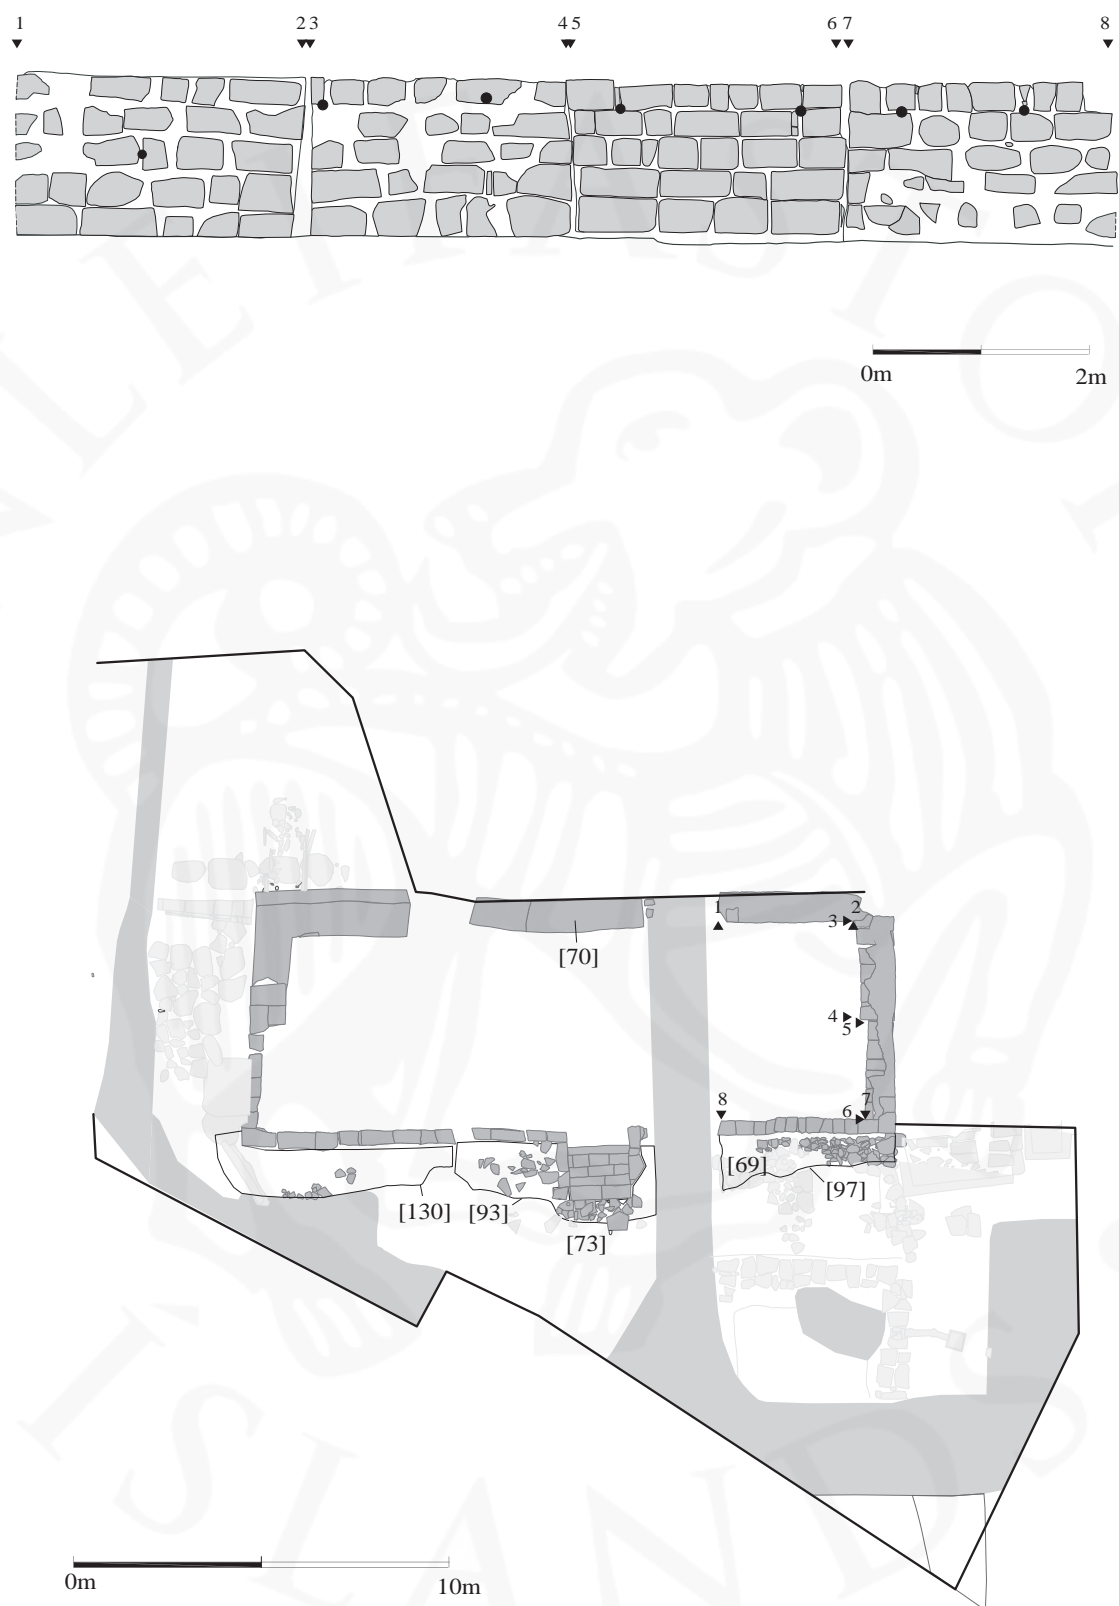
Building [45]: plan and wall elevations. For northern face of western end see later figure.
